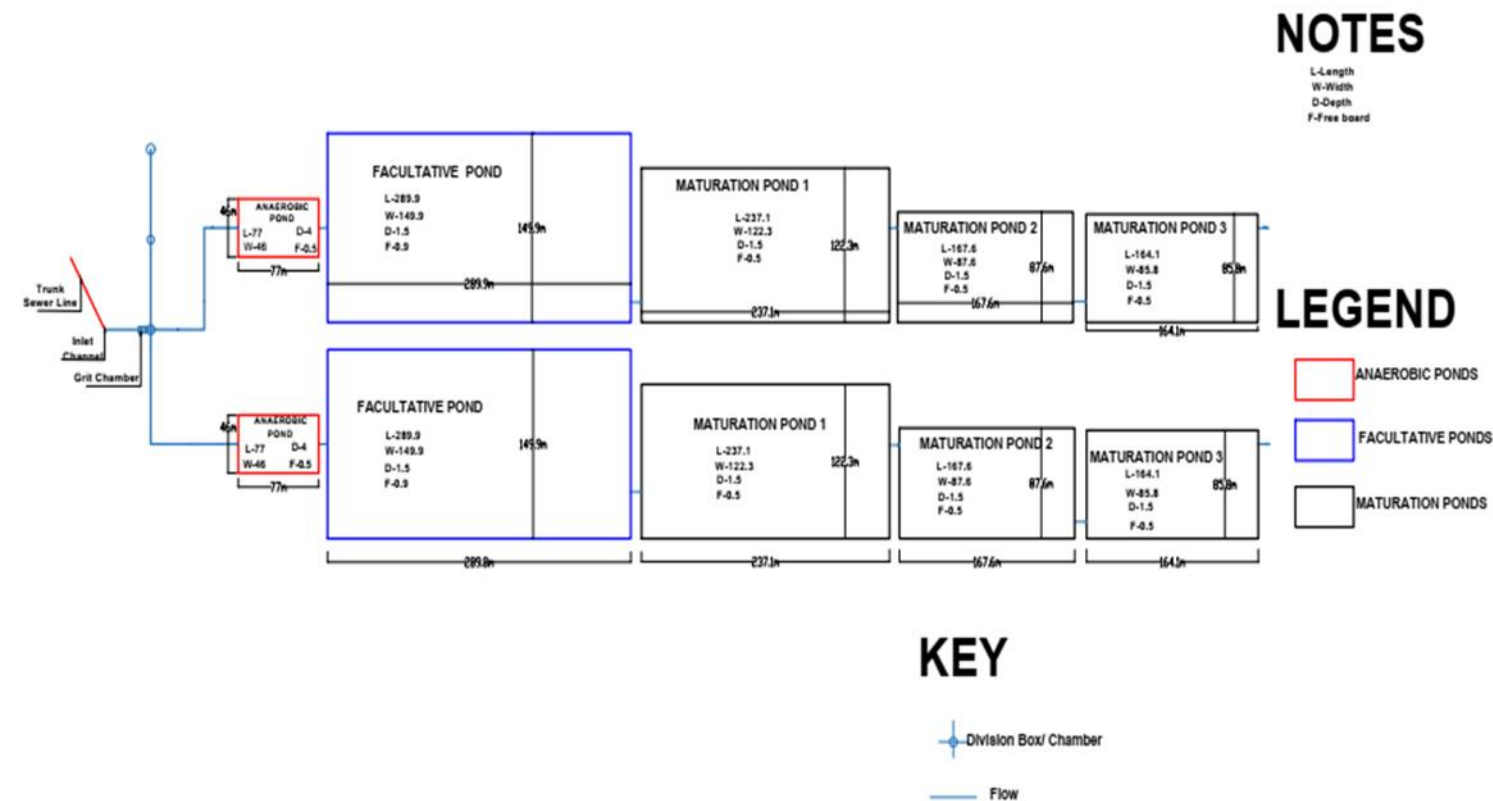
Layout Plan of the Proposed Sewerage Treatment Plant
